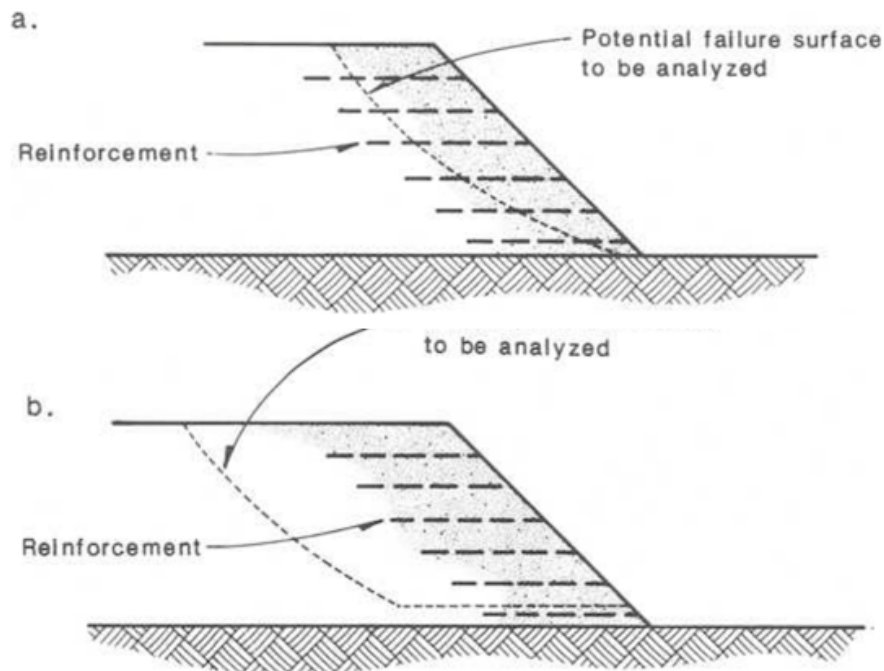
Failure modes for reinforced slopes: (a) internal failure; (b) external failure (Bonaparte et al., 1987)
